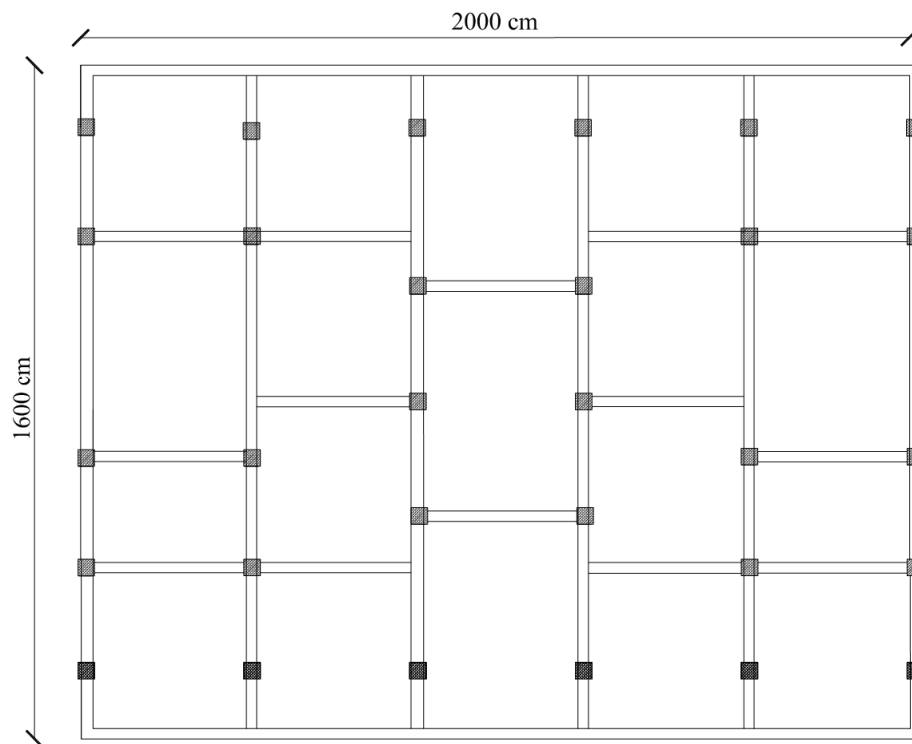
Floor plan of structure D ($T=0.64$ sec, $GDF=0.64$)
